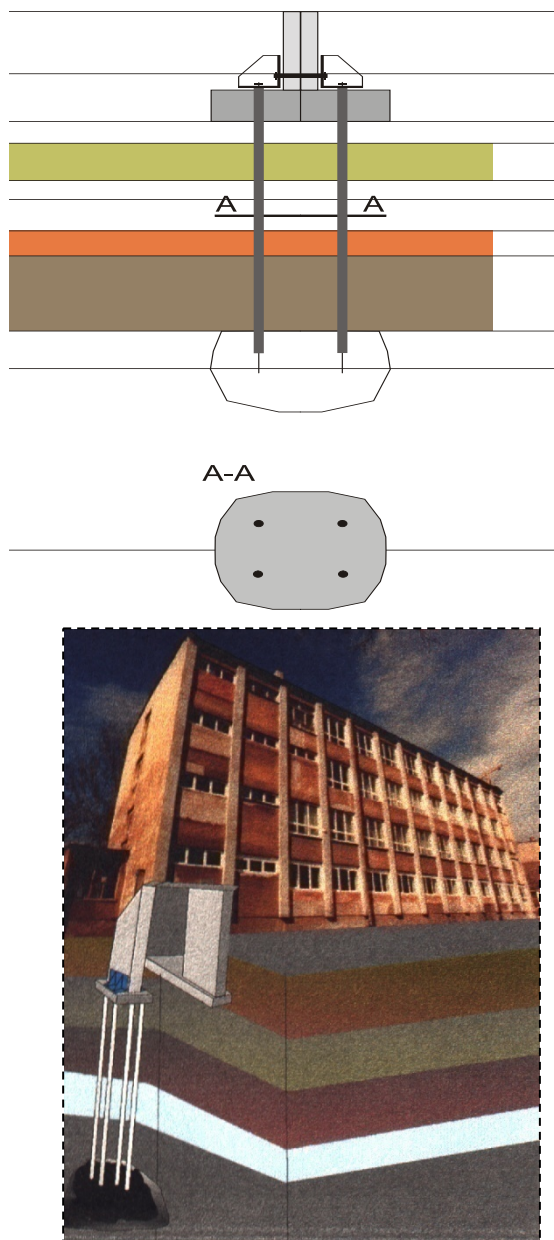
A scheme of foundation reinforced with a bundle of piles joined by concrete base
